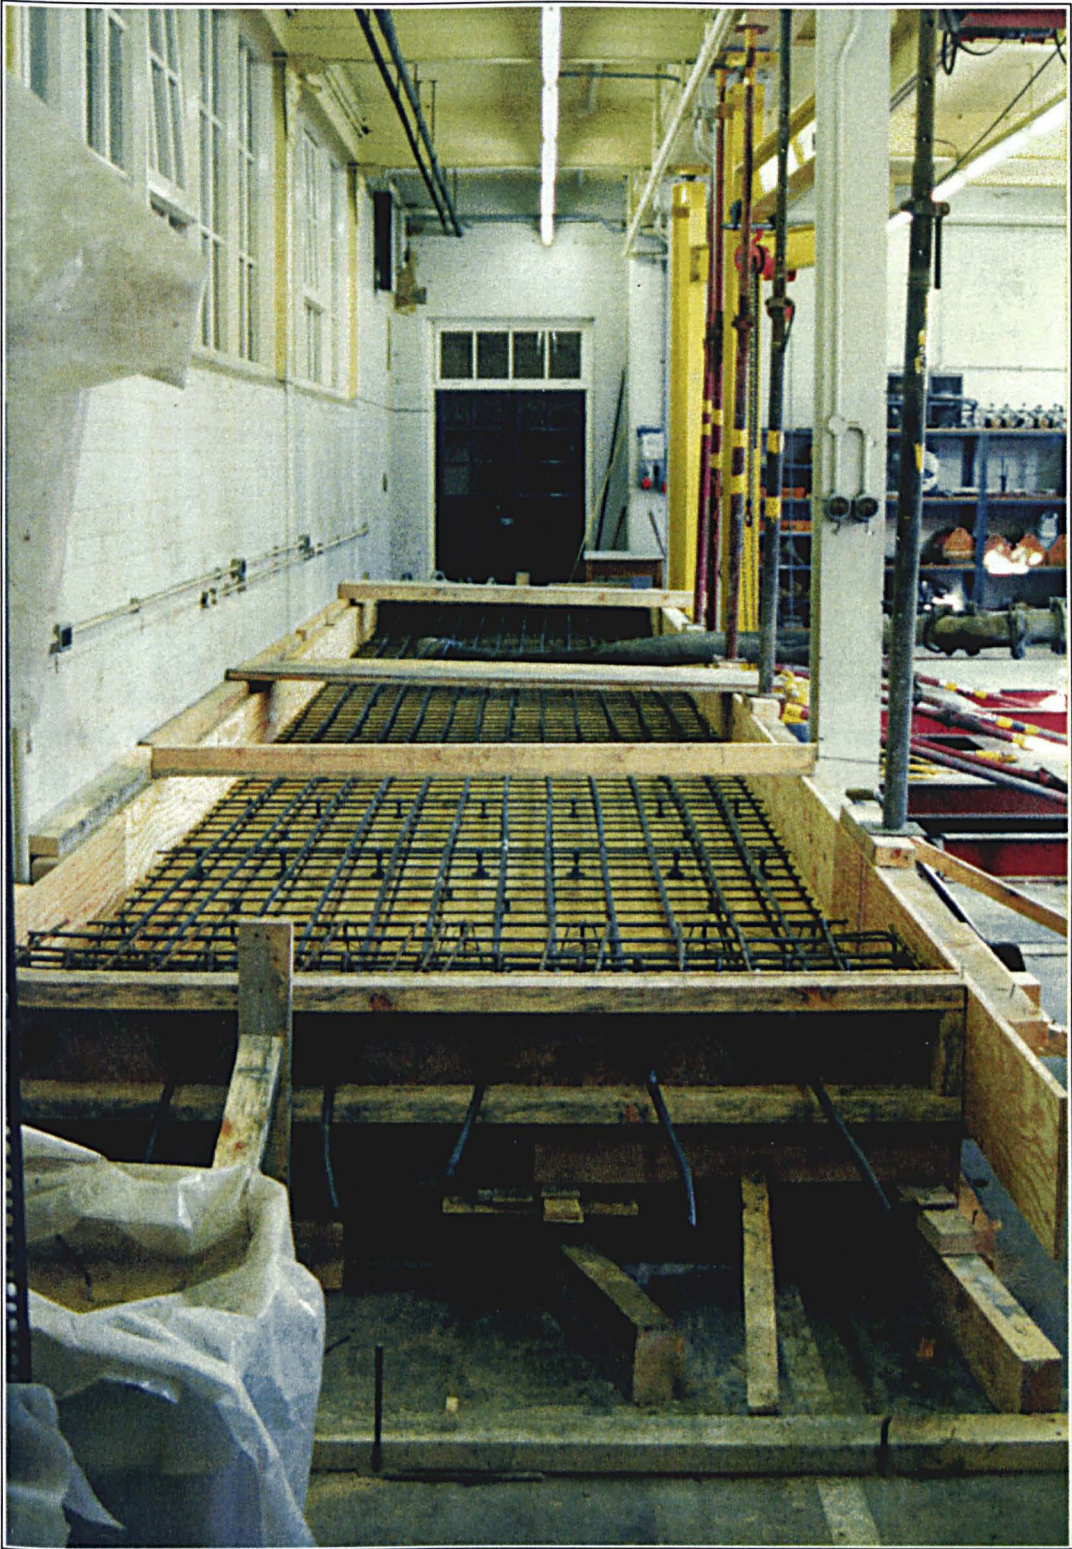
Structure C - Photograph Prior to Concreting Illustrating Formwork, Reinforcement and Prestressing.
